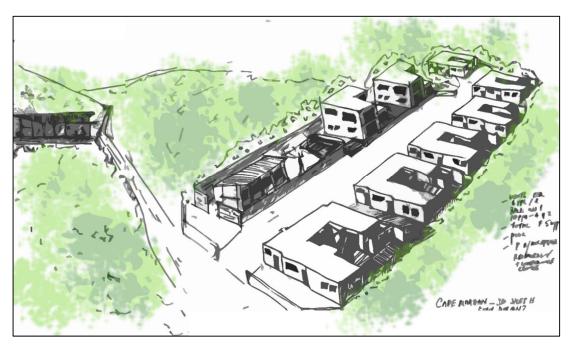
3D DIAGRAM AND PLAN LAYOUT
